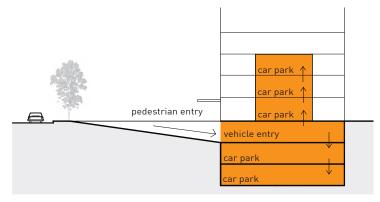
B.20-2: Multi-storey car park is housed within the building to facilitate active street frontages.
